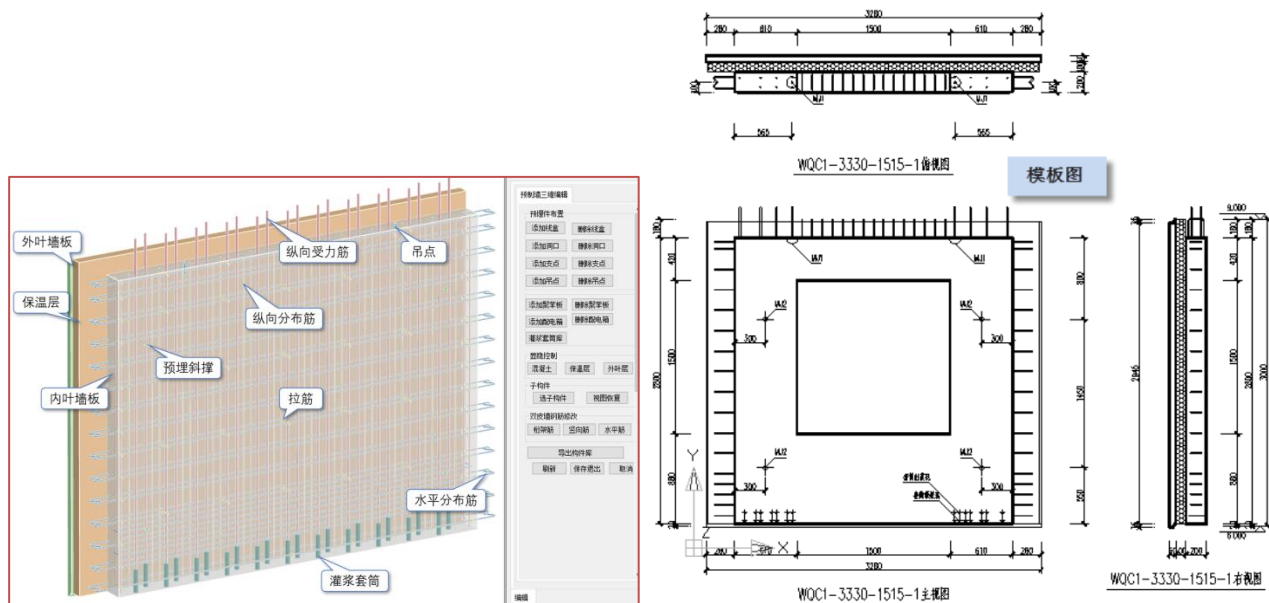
a sandwich prefabricated exterior wall(with a insulation layer which is larger than wall itself)
